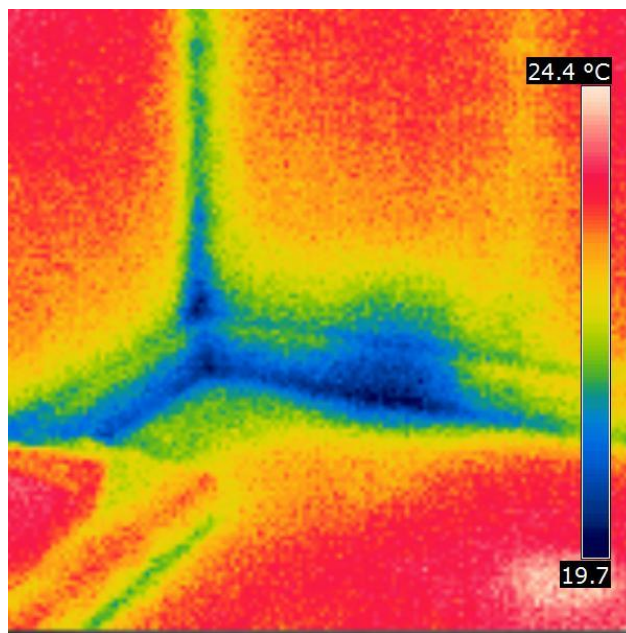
Thermographic image of corner detail, connection between two external walls and floor slab.
